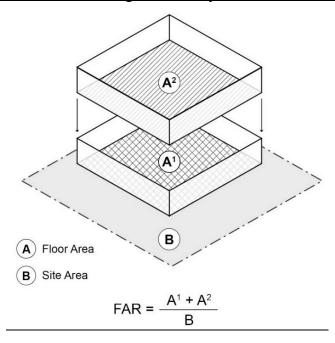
D - Floor Area Ratio (FAR) Calculation
